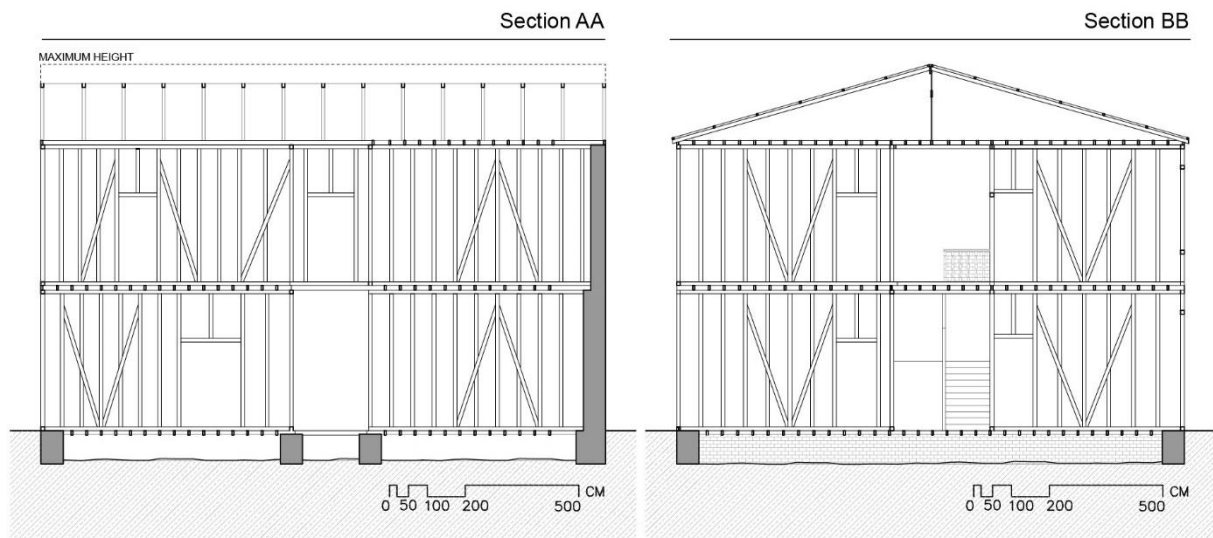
Sections AA and BB of Building 2, as reported in the drawings of Figure 6-5.
